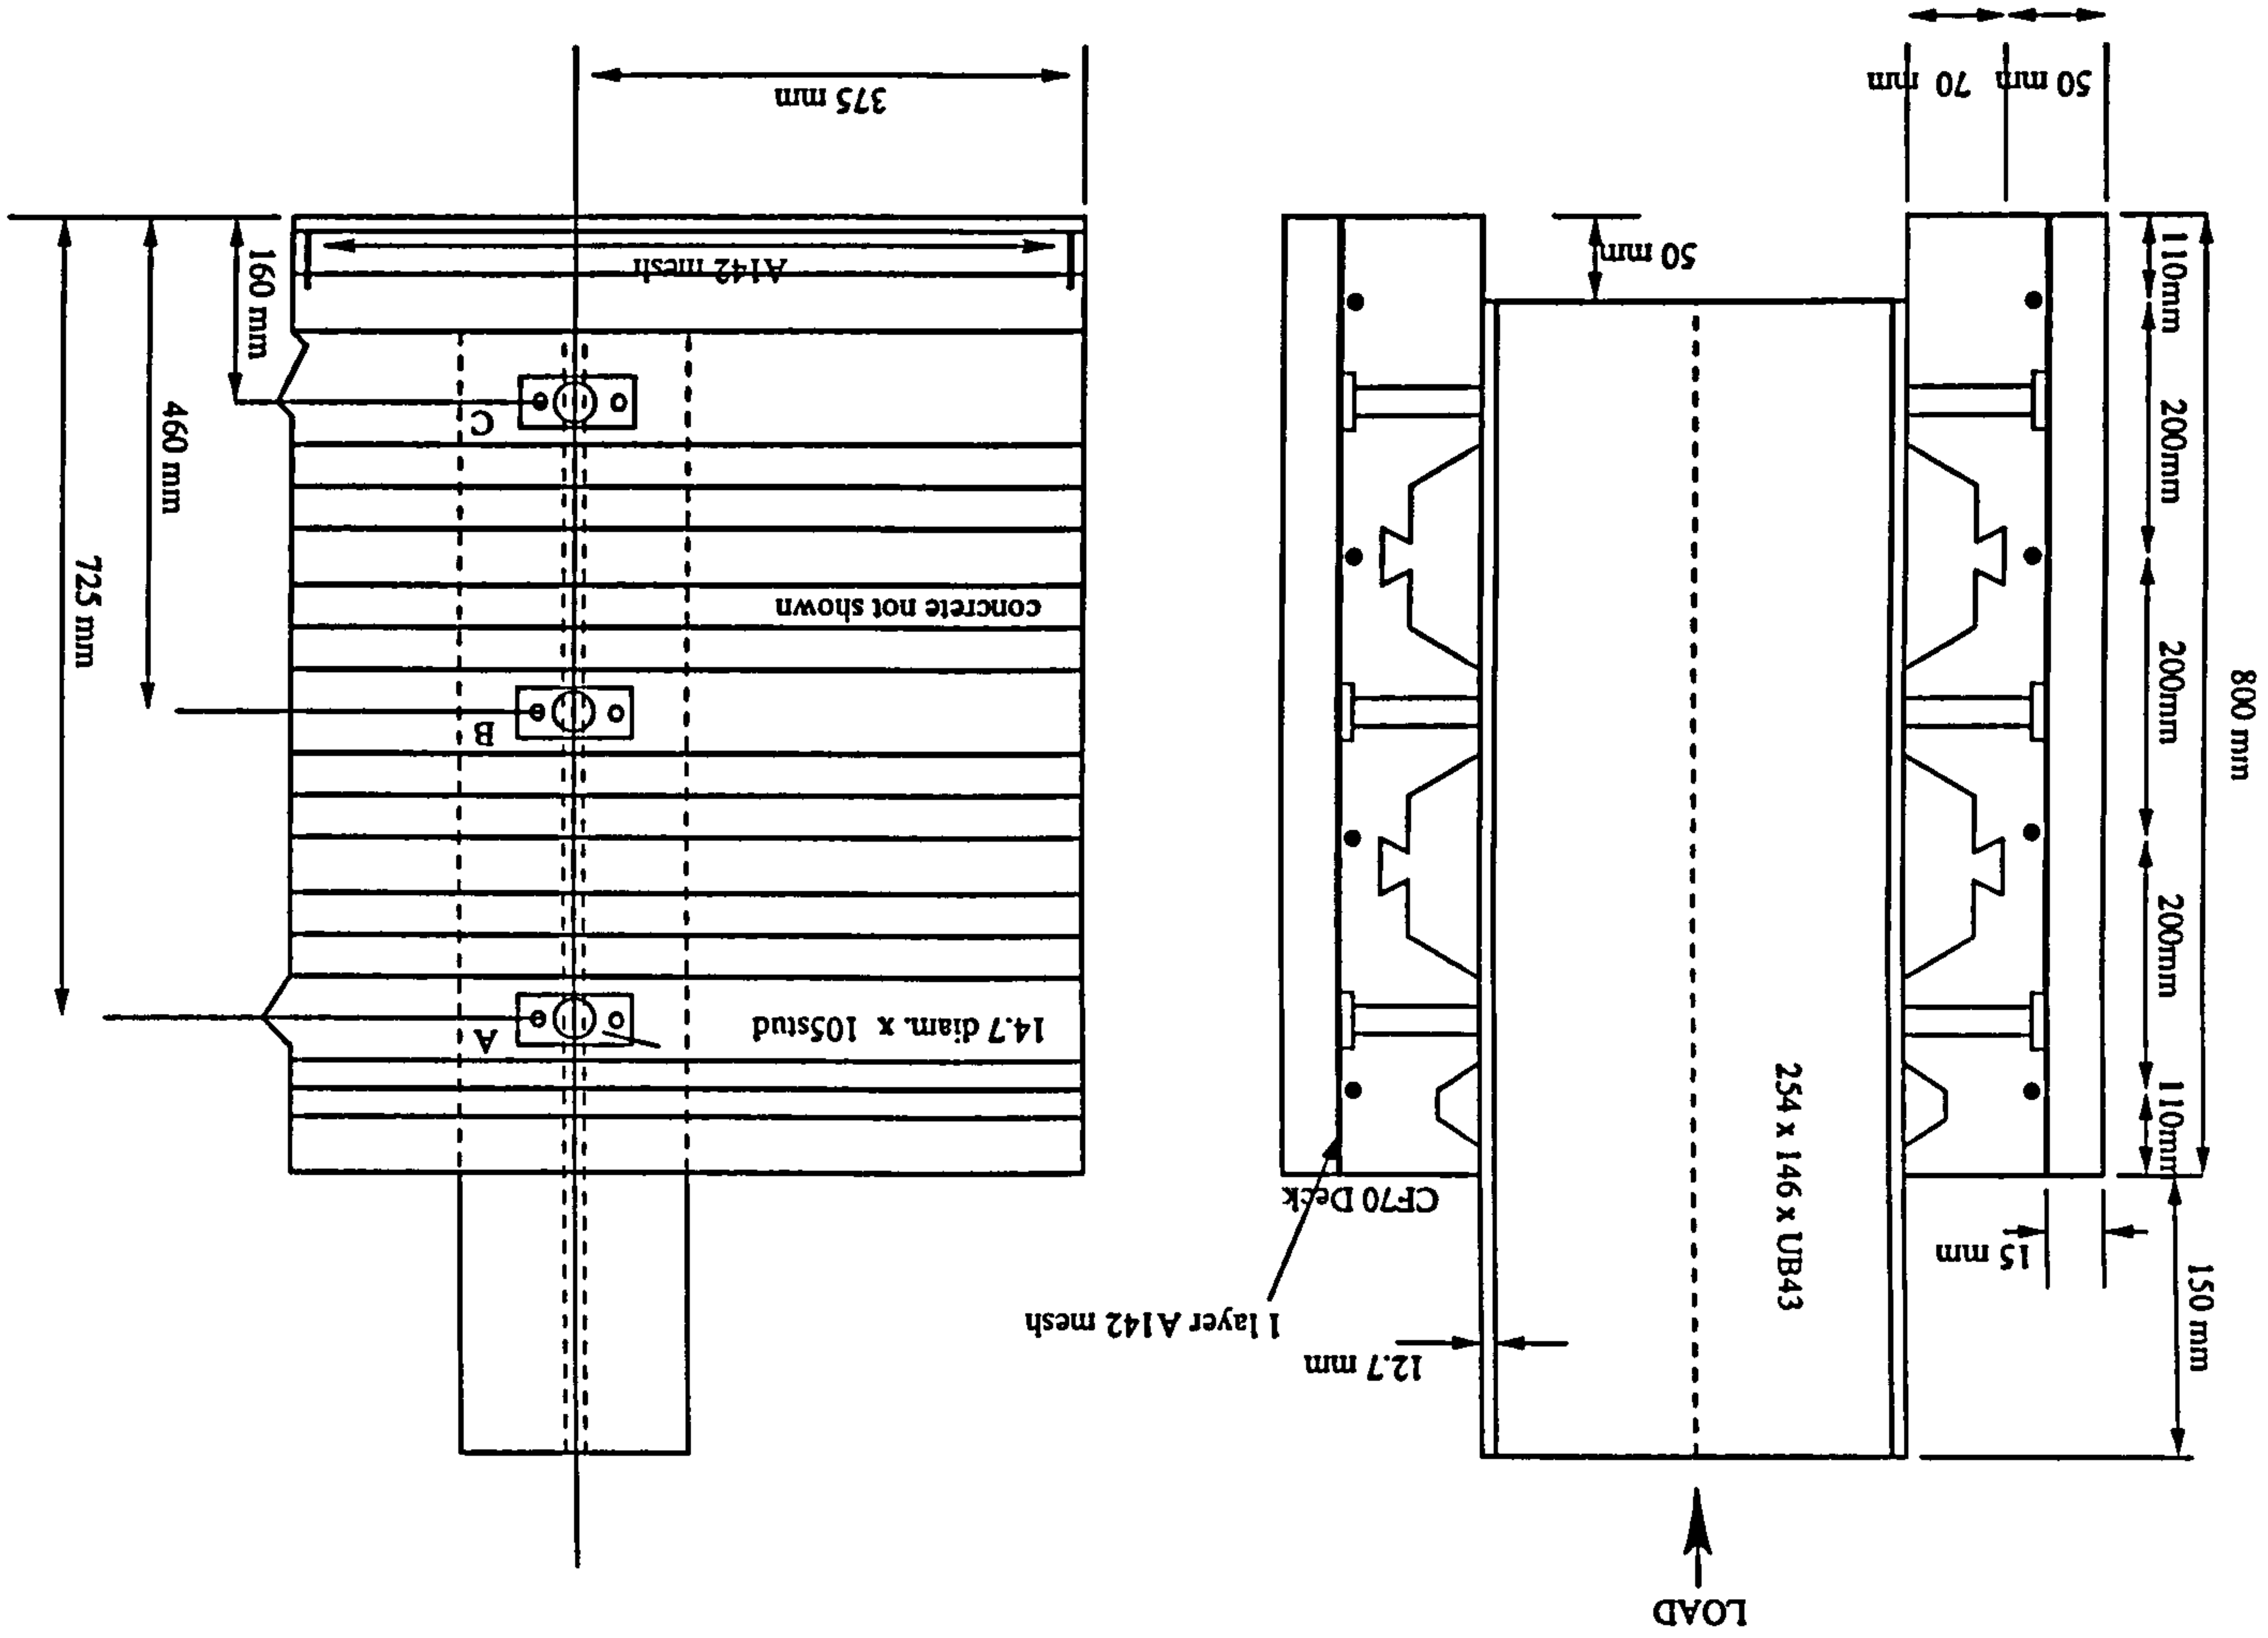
Test configuration using CF70 decking in specimen CF30-5
